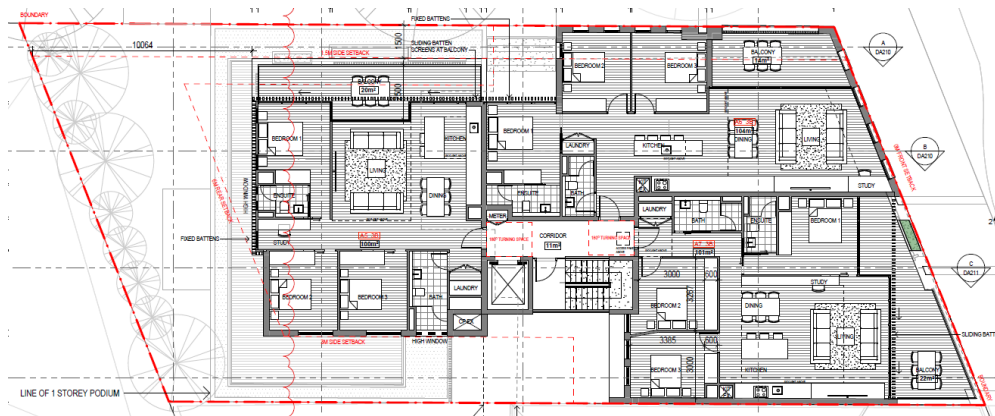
Proposed level 3 floor plan - 18-20A Perouse Road, Randwick (Source: Curzon & Partners)
